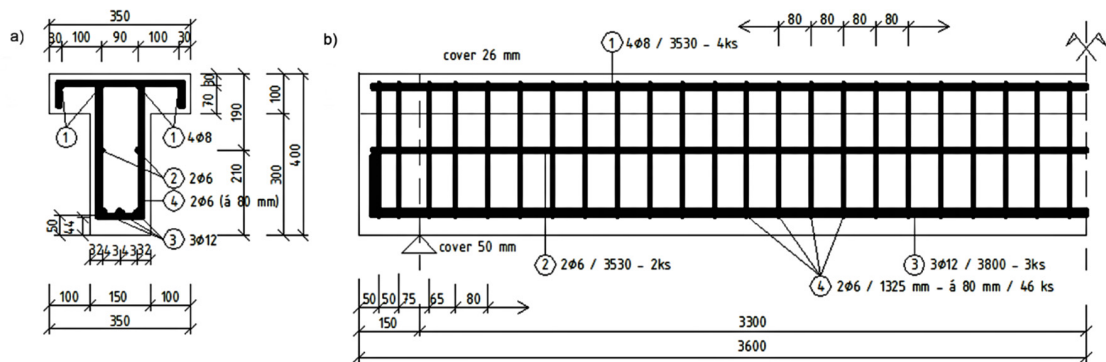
(a) Cross section of the T-beam; (b) longitudinal section of the T-beam.
